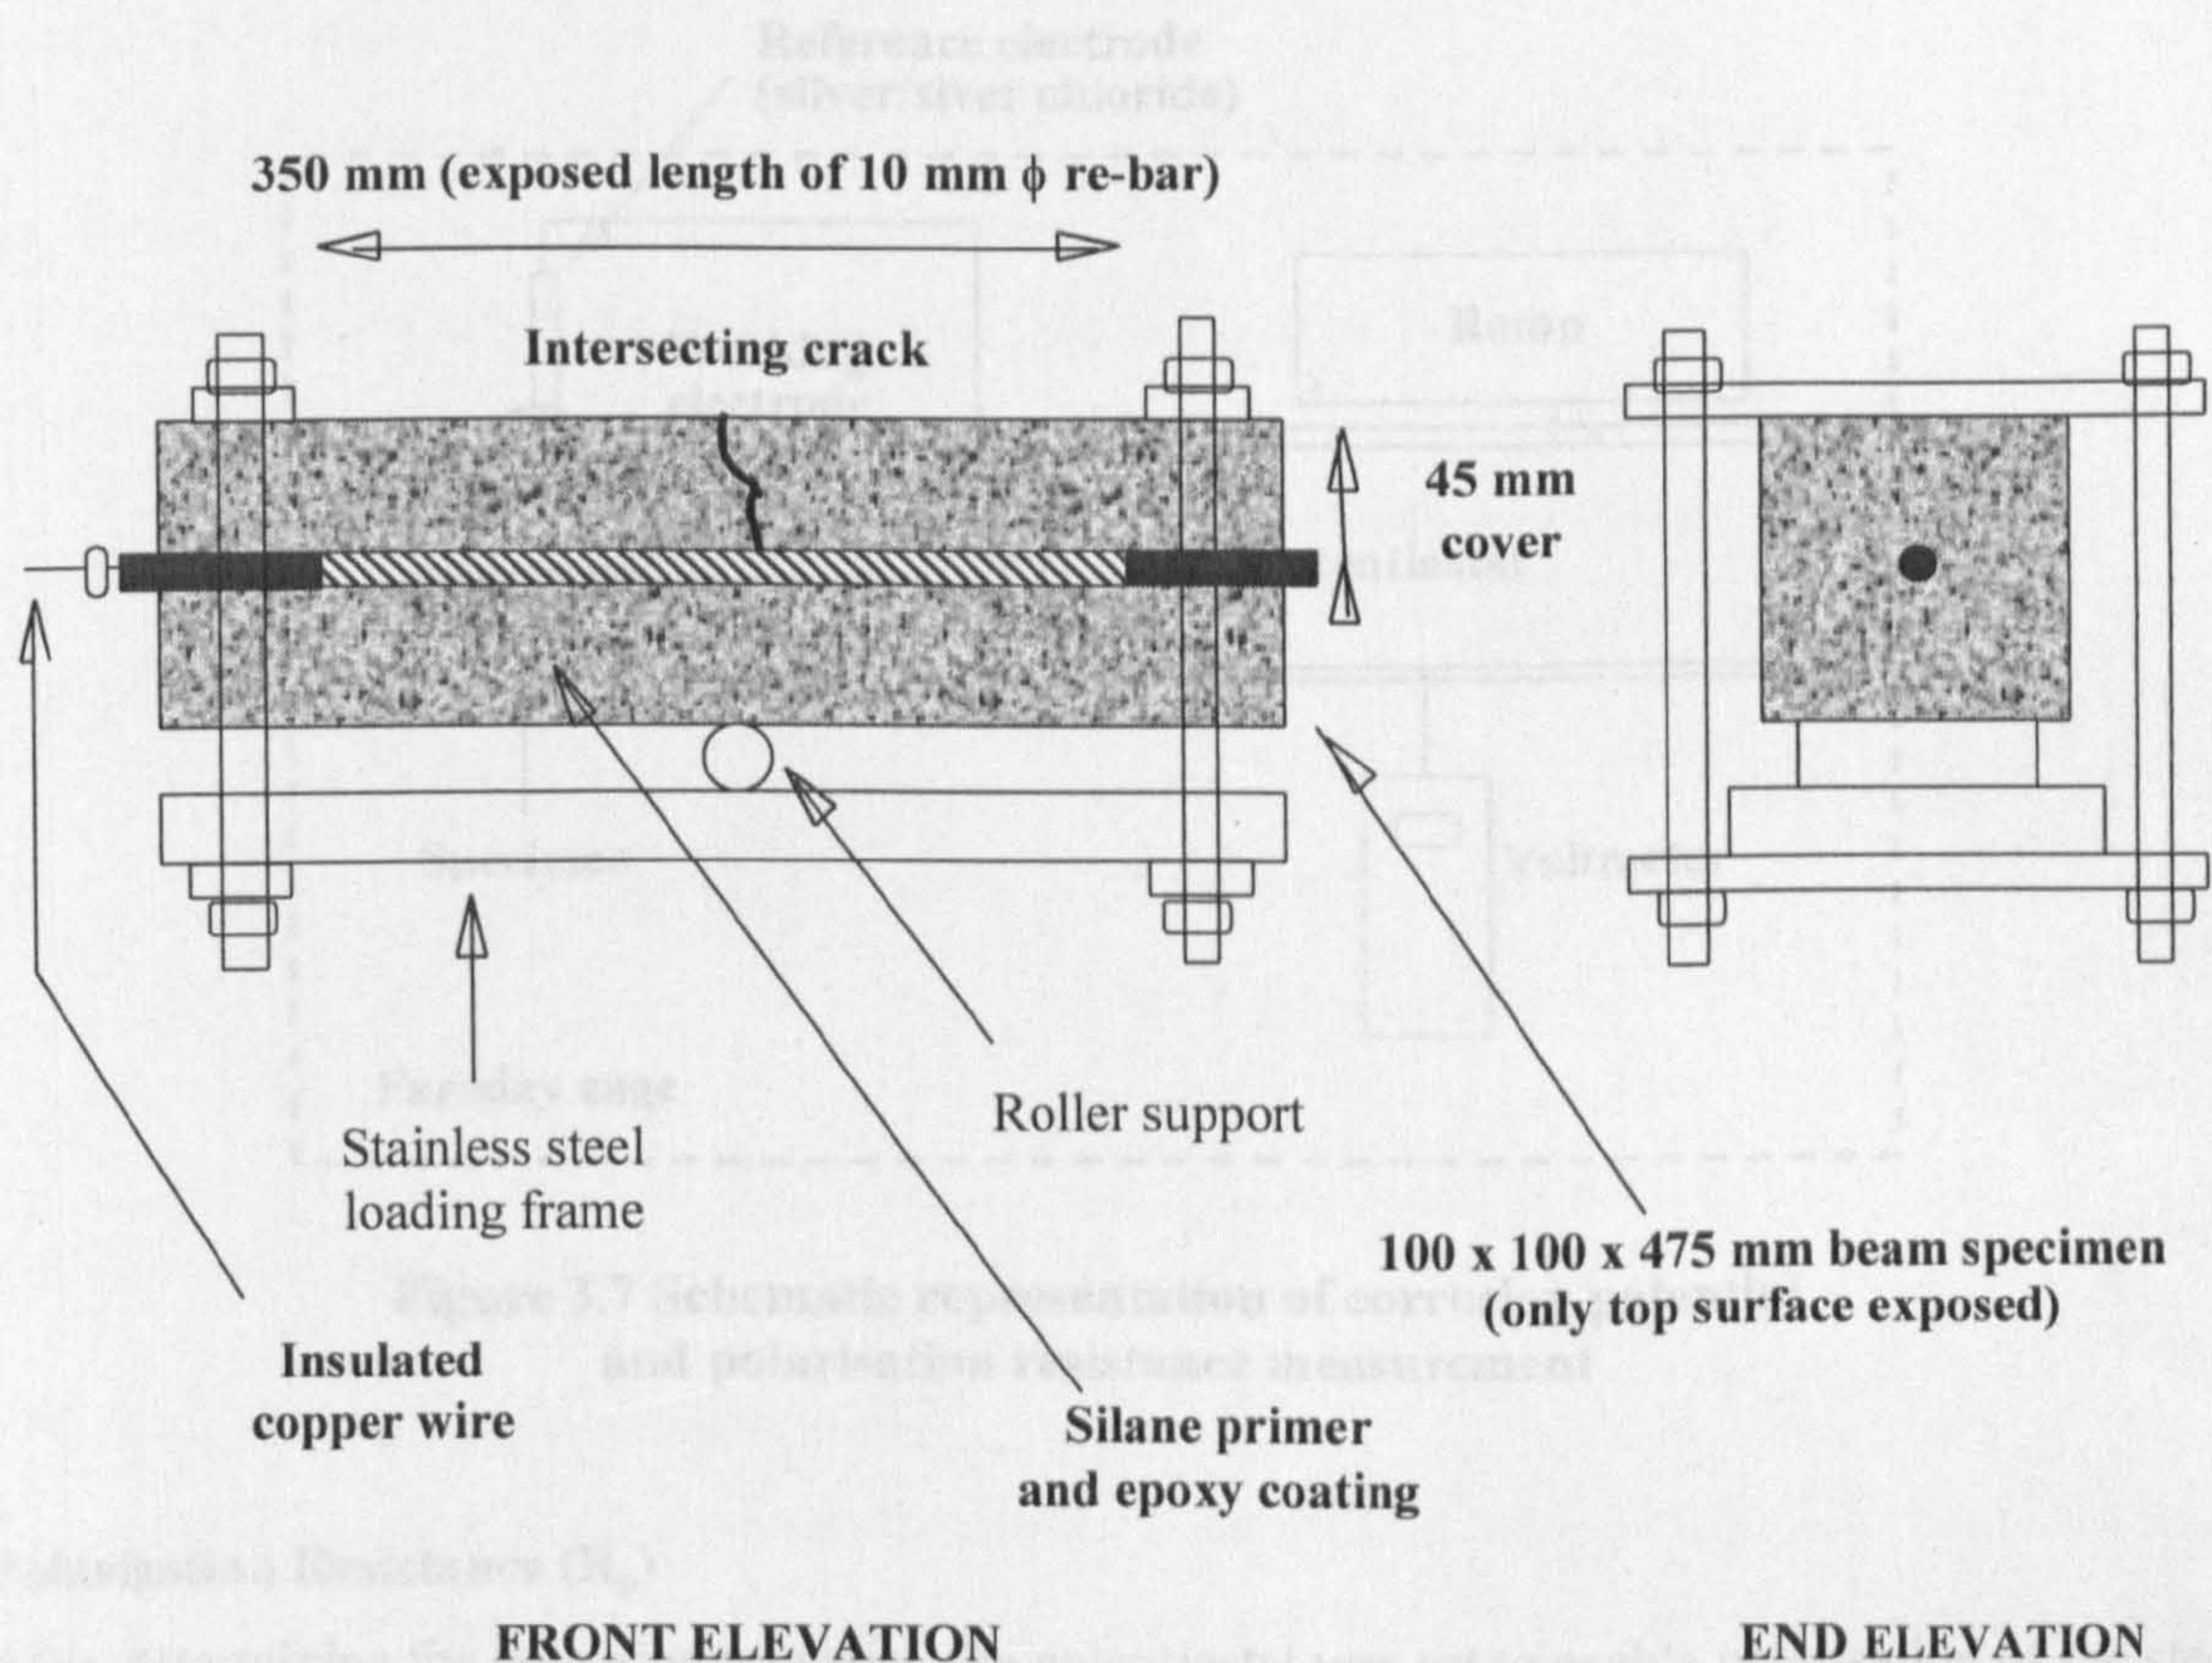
Loading arrangement and details of a reinforced concrete beam specimen
